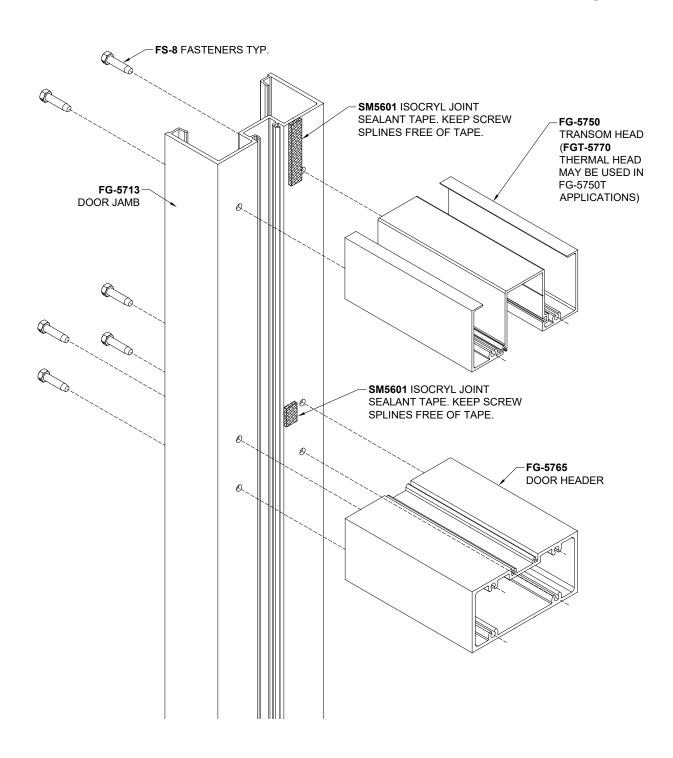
FG-5750 StormMax® Door Frame Assembly Option 2
